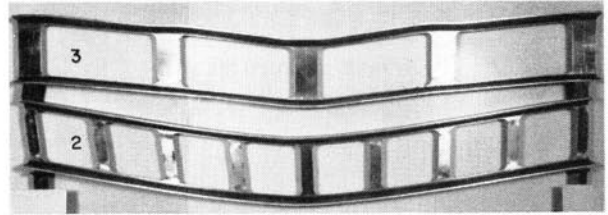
Center Loading Failures in 6-in. I-Beams, Rectangular Cutouts
